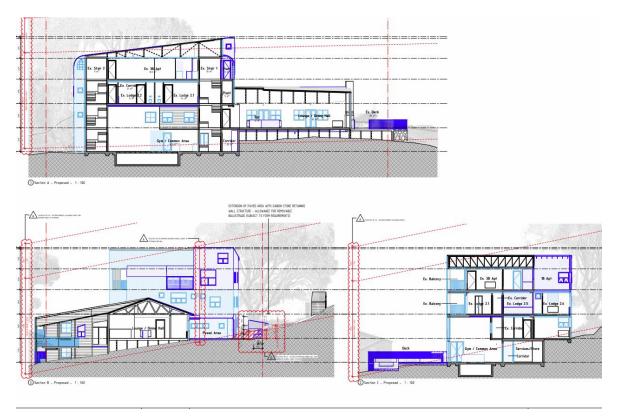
Sections, showing proposed development in blue outline – (Source: Application)
